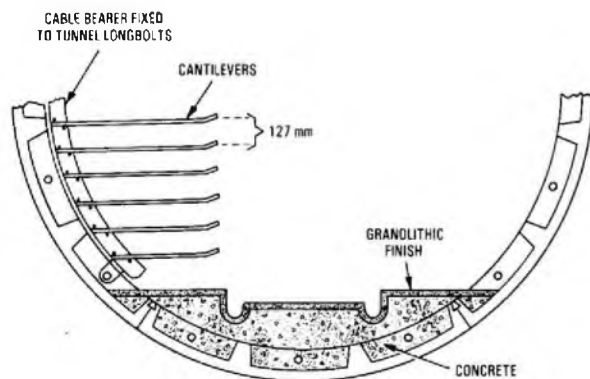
Sectional drawing of 2.438 m diameter tunnel showing the floor profile
